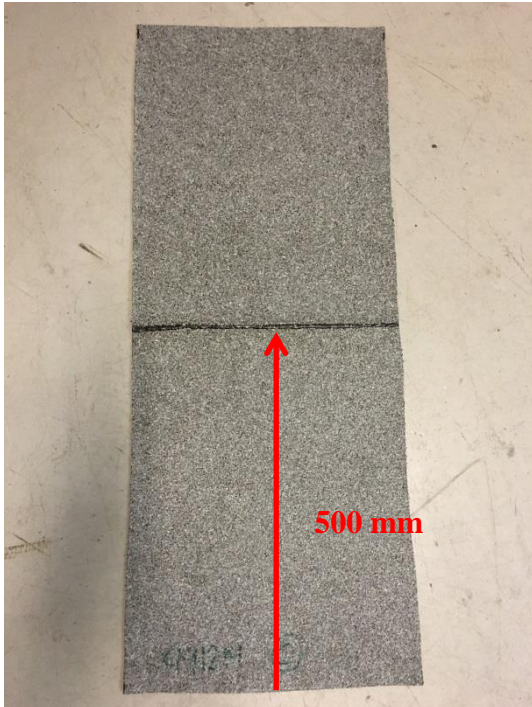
Specimen cut across the roll and welded 500 mm from the bottom edge.
